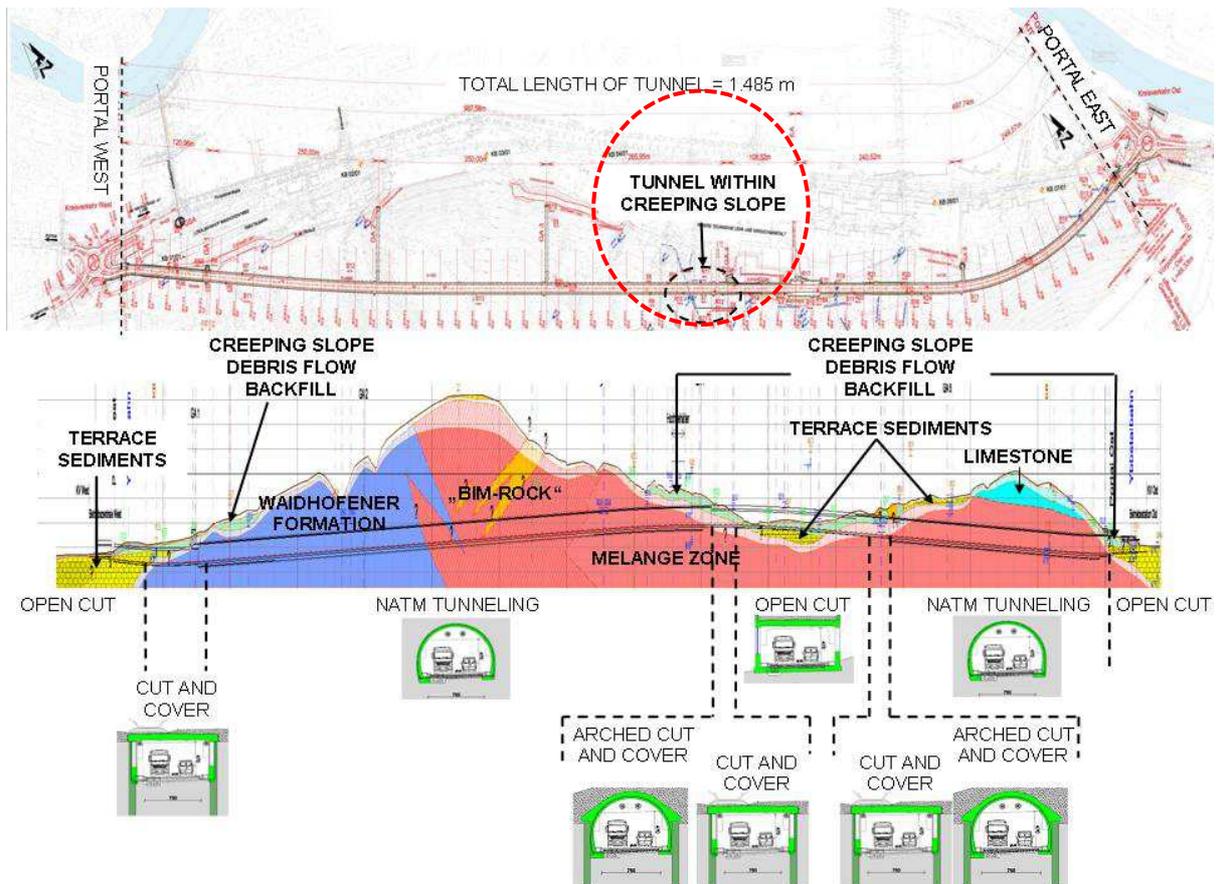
City Tunnel Waidhofen an der Ybbs. Tunnel alignment in the project area and geological longitudinal section with different tunnelling methods. Zones with creeping slopes are shown.
